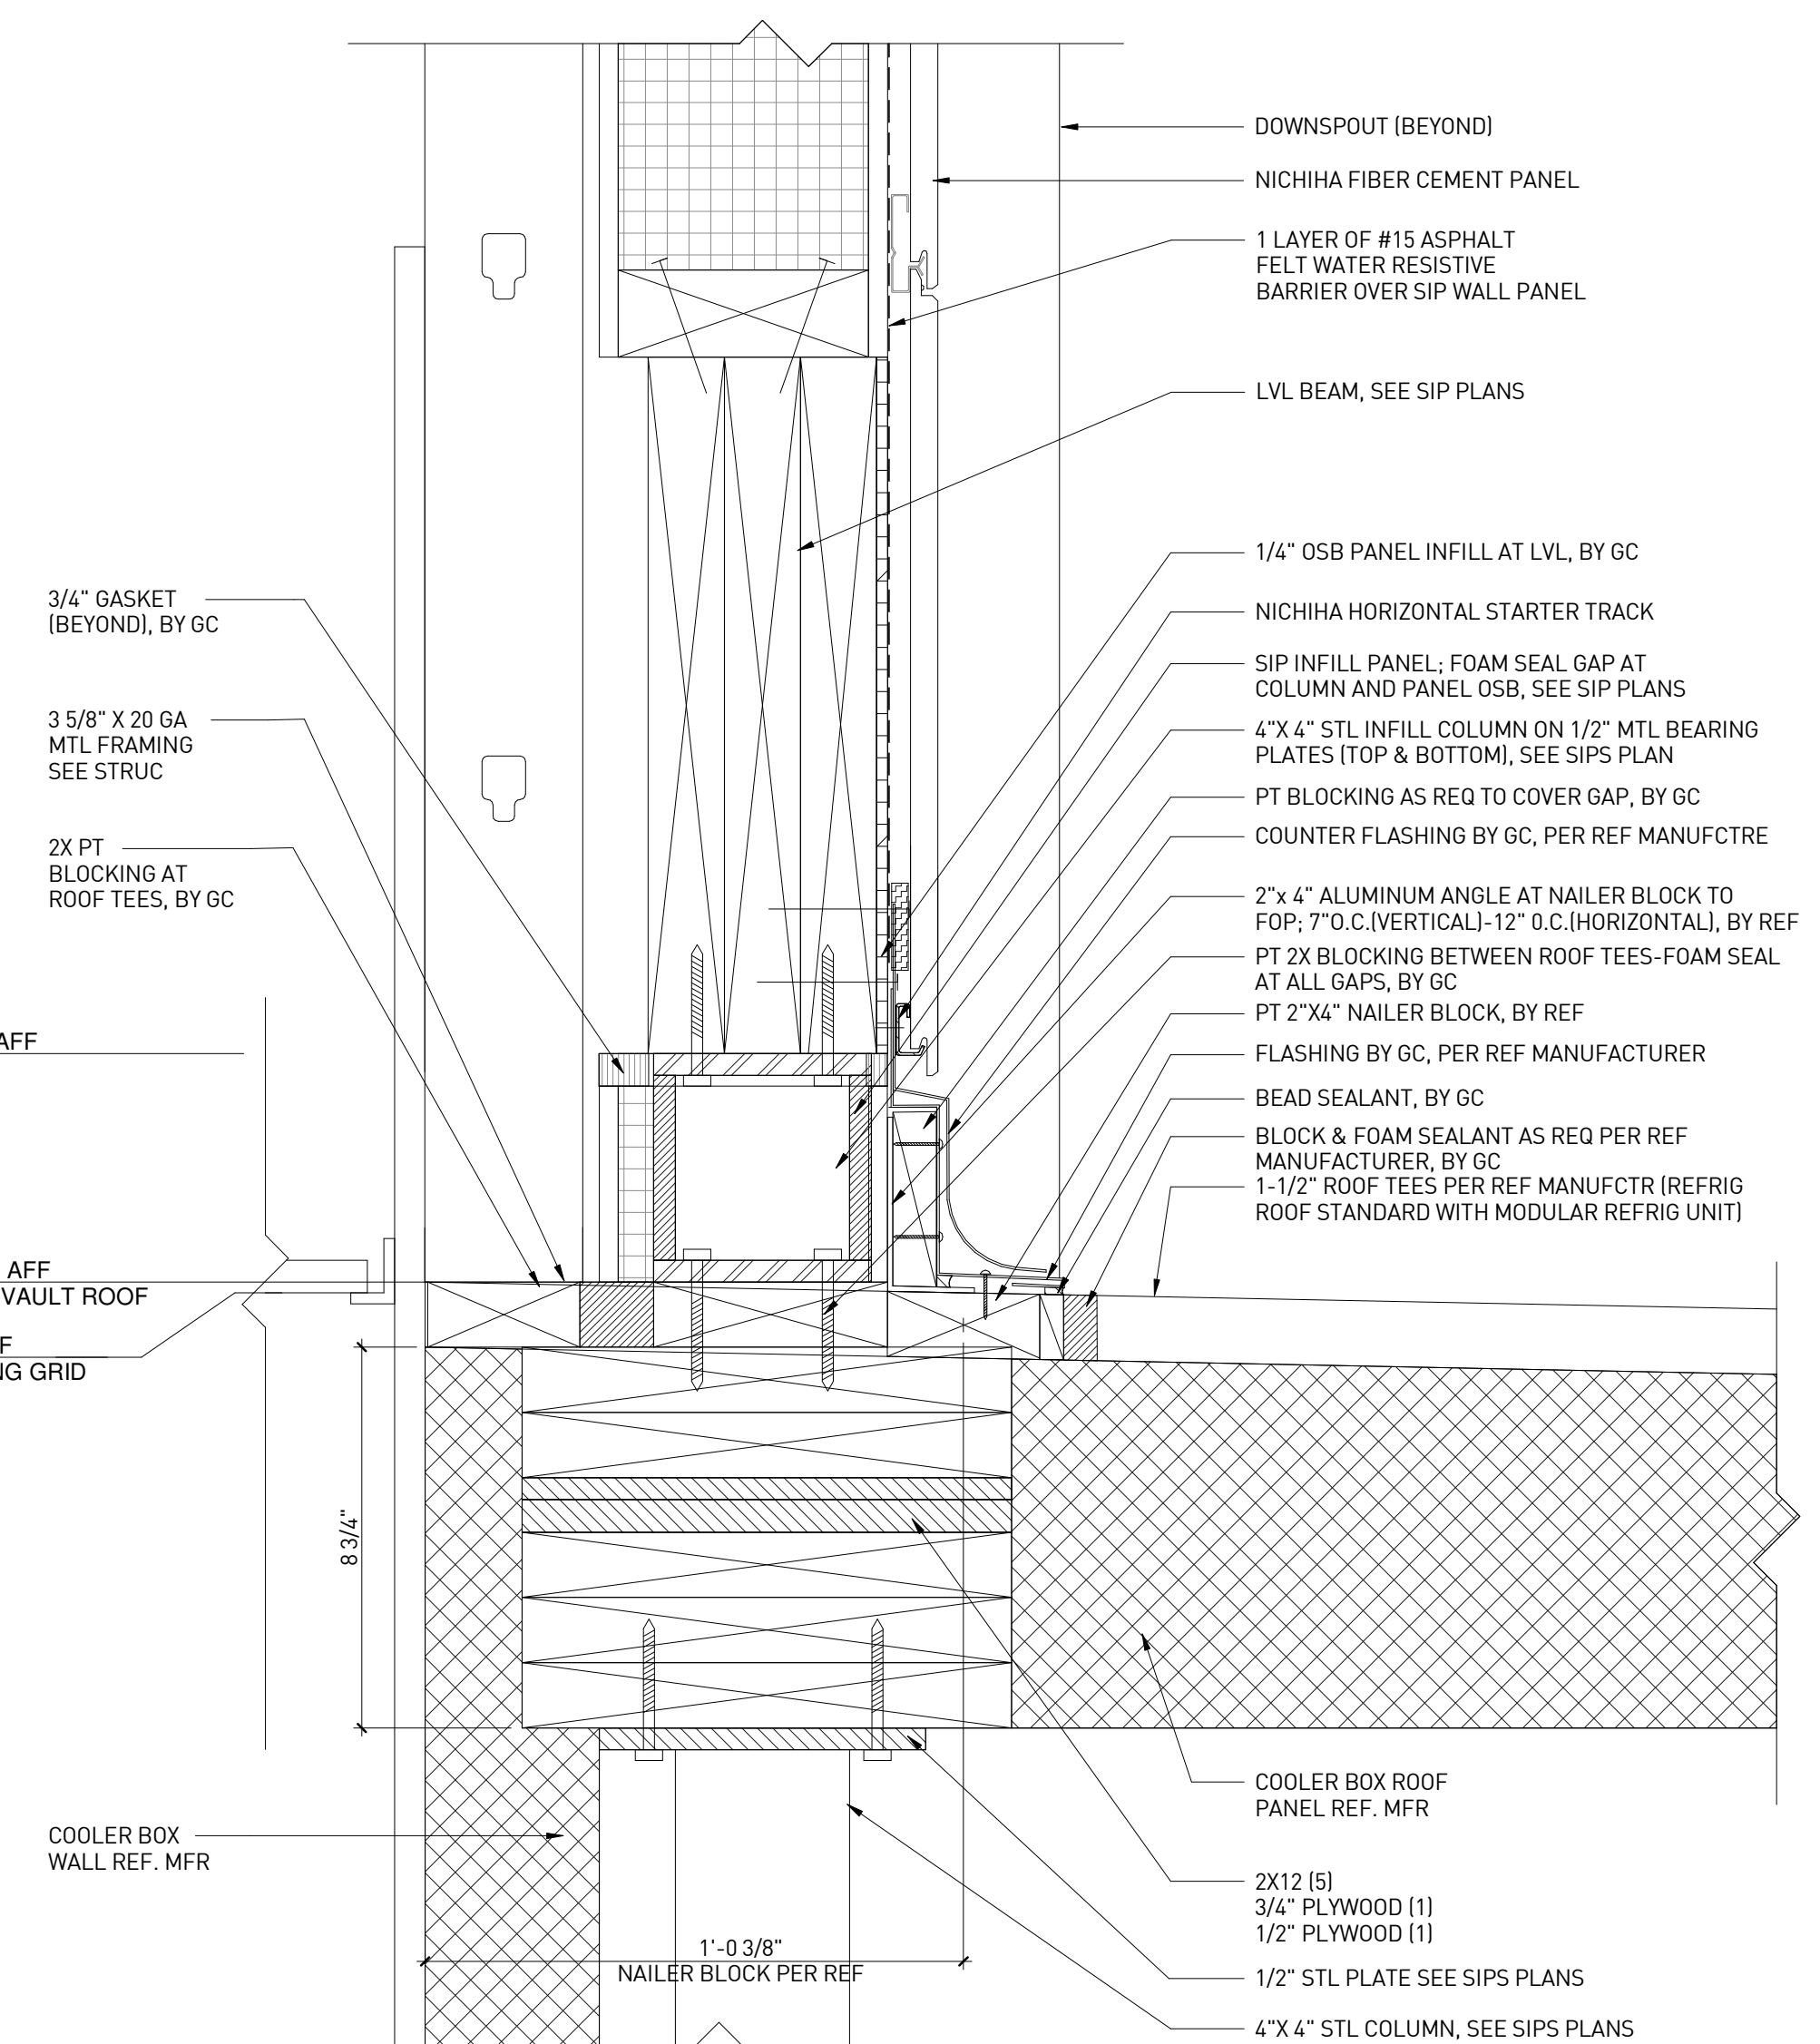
DETAIL AT REFRIGERATION PANEL & SIP WALL | 10
